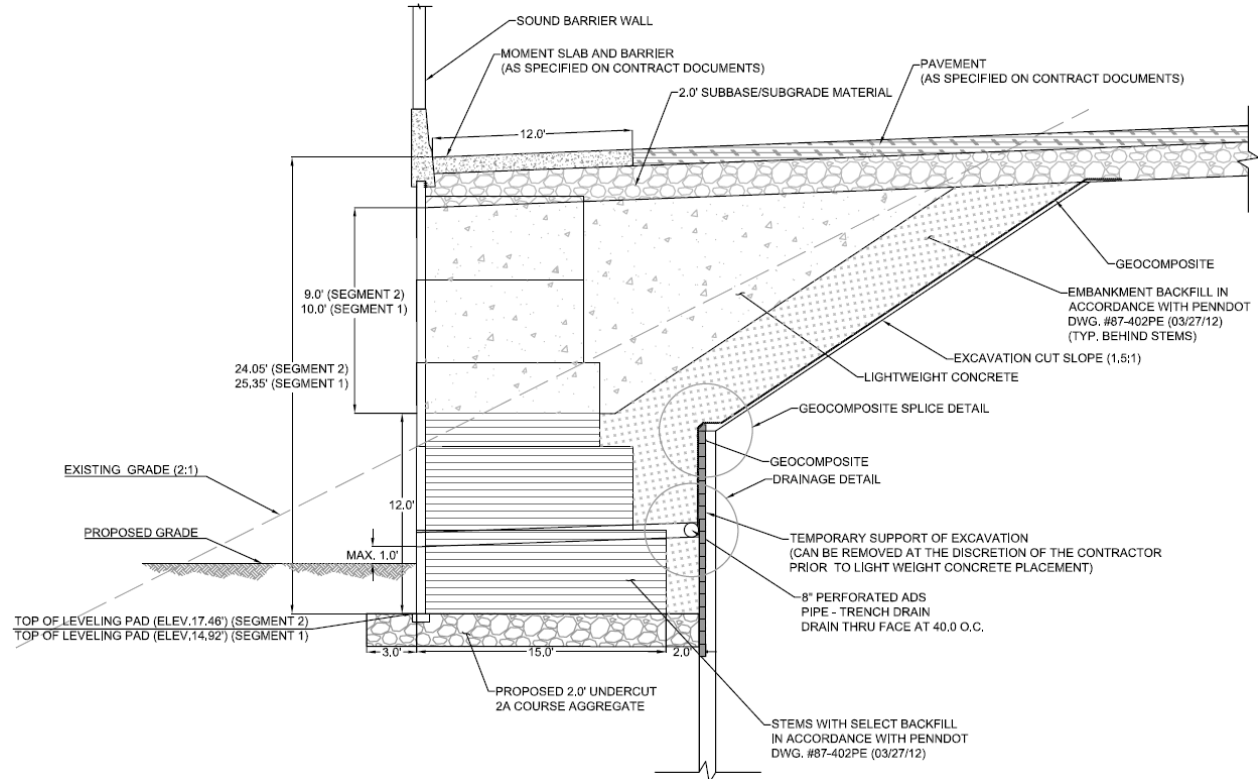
Typical cross section for Wall 11 (S-32669).
